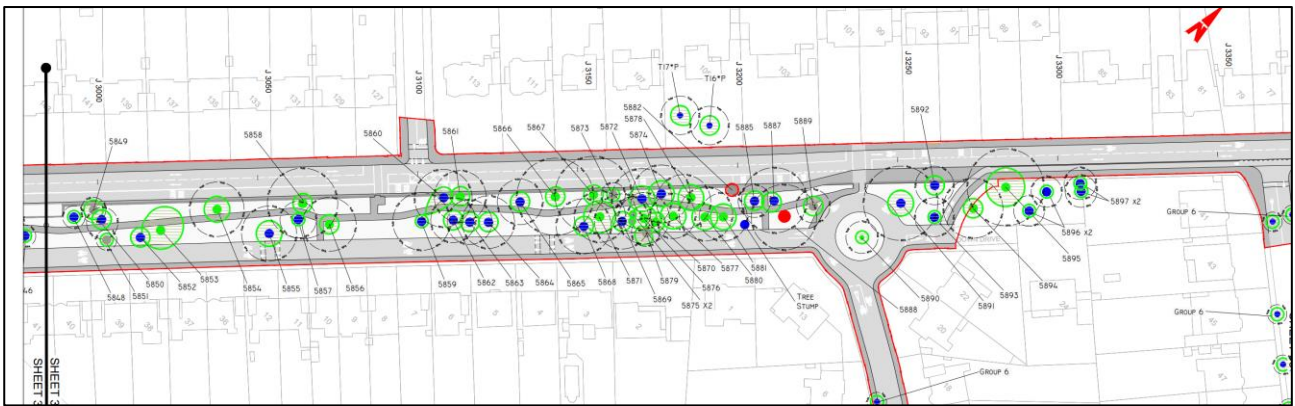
Extract from Tree Protection Plan Sheet 36 of 37
